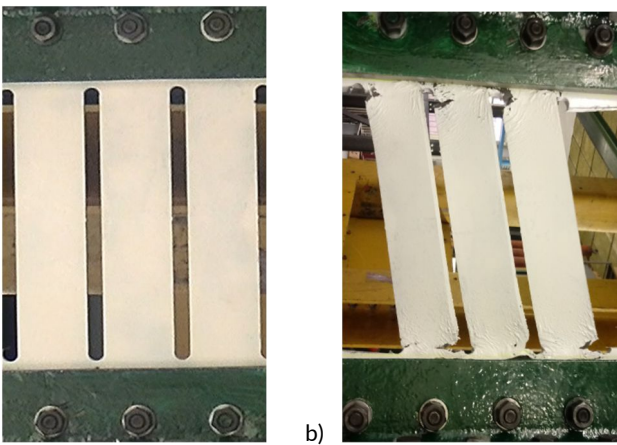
Photo of Specimens A6: a)Start of the test,b) Fracture-end test
